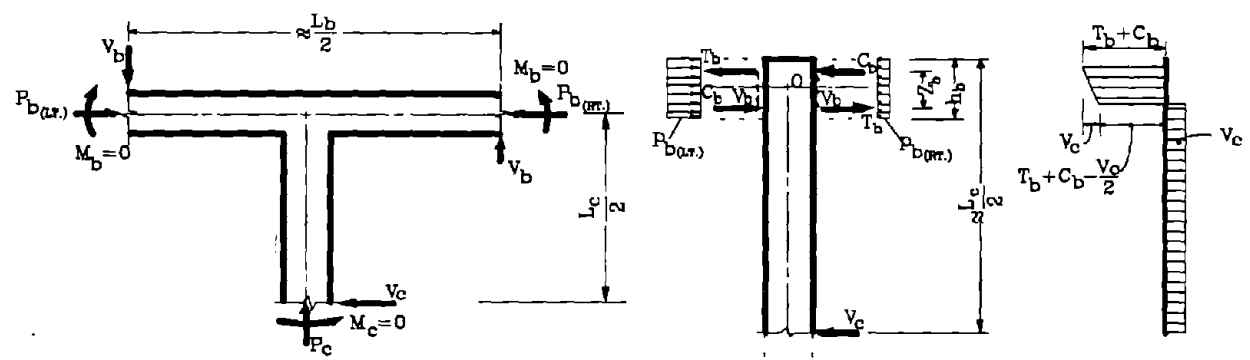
Equilibrium of Exterior Top Floor Beam-Column Subassembly
